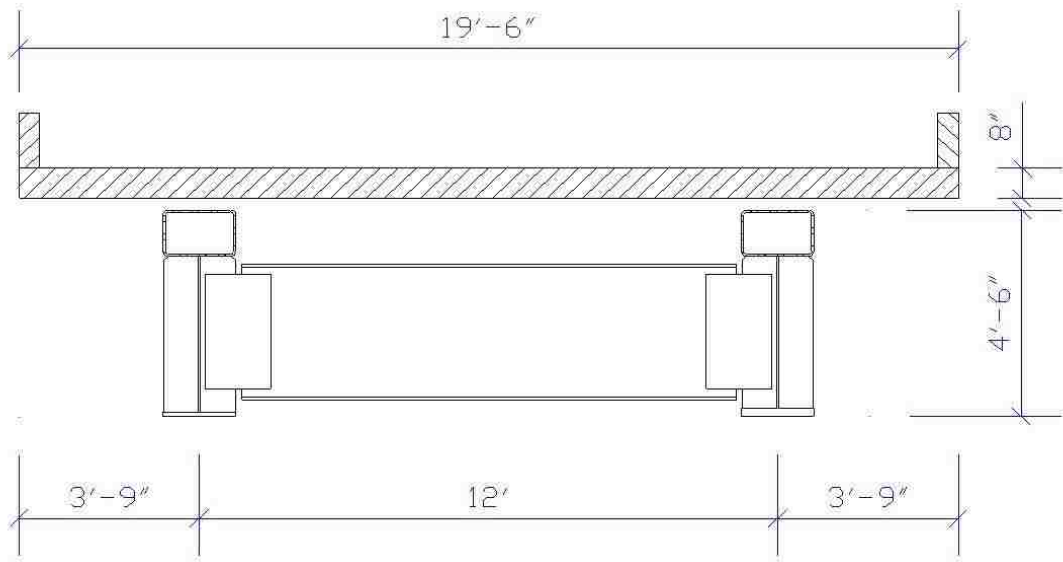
Cross section view of full-scale TFG bridge (Sause et al., 2009)
